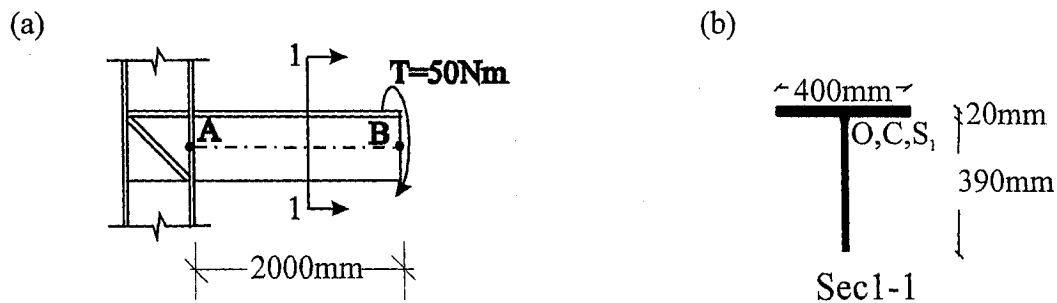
Cantilever beam with tee section (a) Geometry (b) Cross-section dimensions
